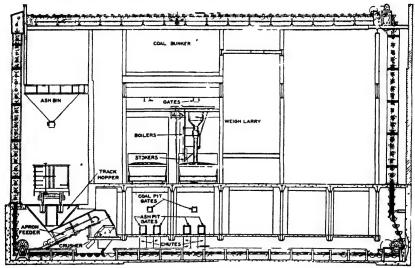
Complete coal- and ash-handling system, employing the Peck pivoted-bucket conveyor
